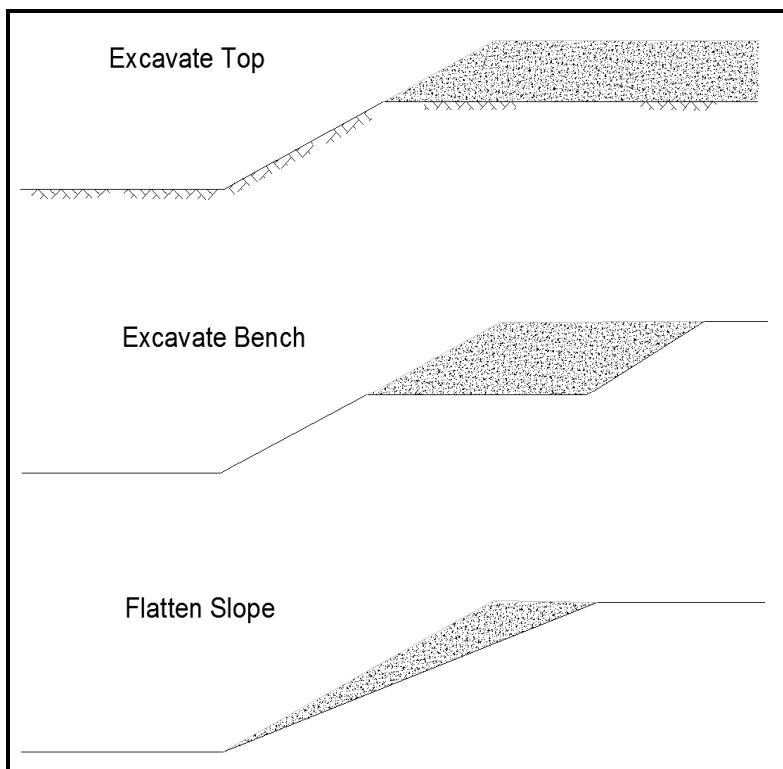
Slope stabilization by excavation (Duncan and Wright, 2005).
